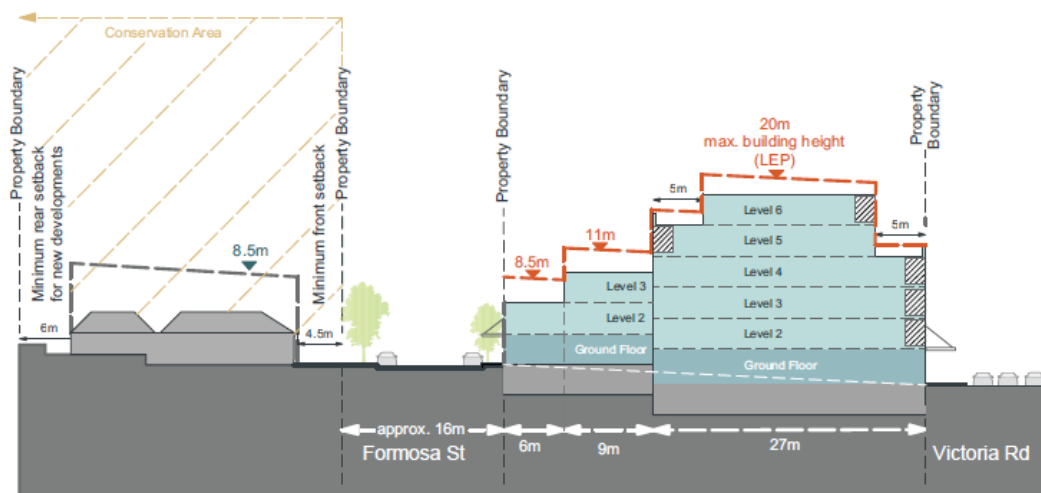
Sectional view showing proposed LEP and DCP maximum building height controls on the western side of Victoria Road
